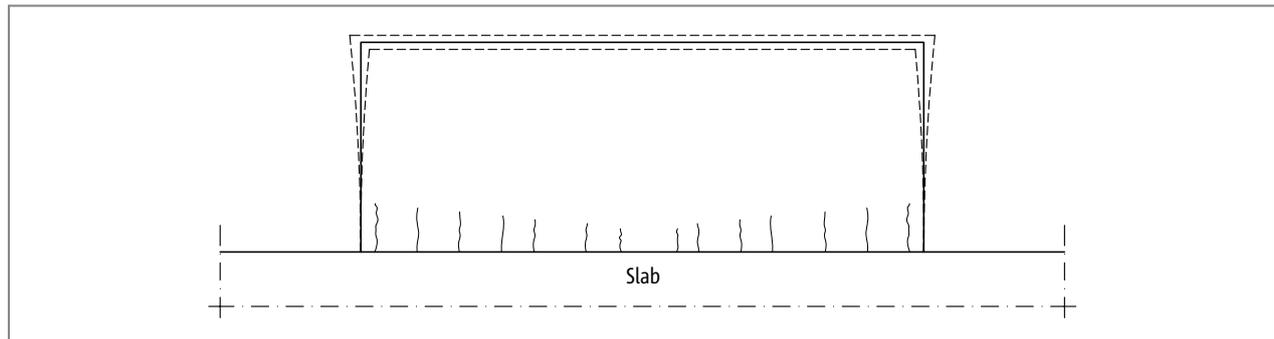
Balcony slab without Schöck Isokorb®: Crack formation through fatigue possible
